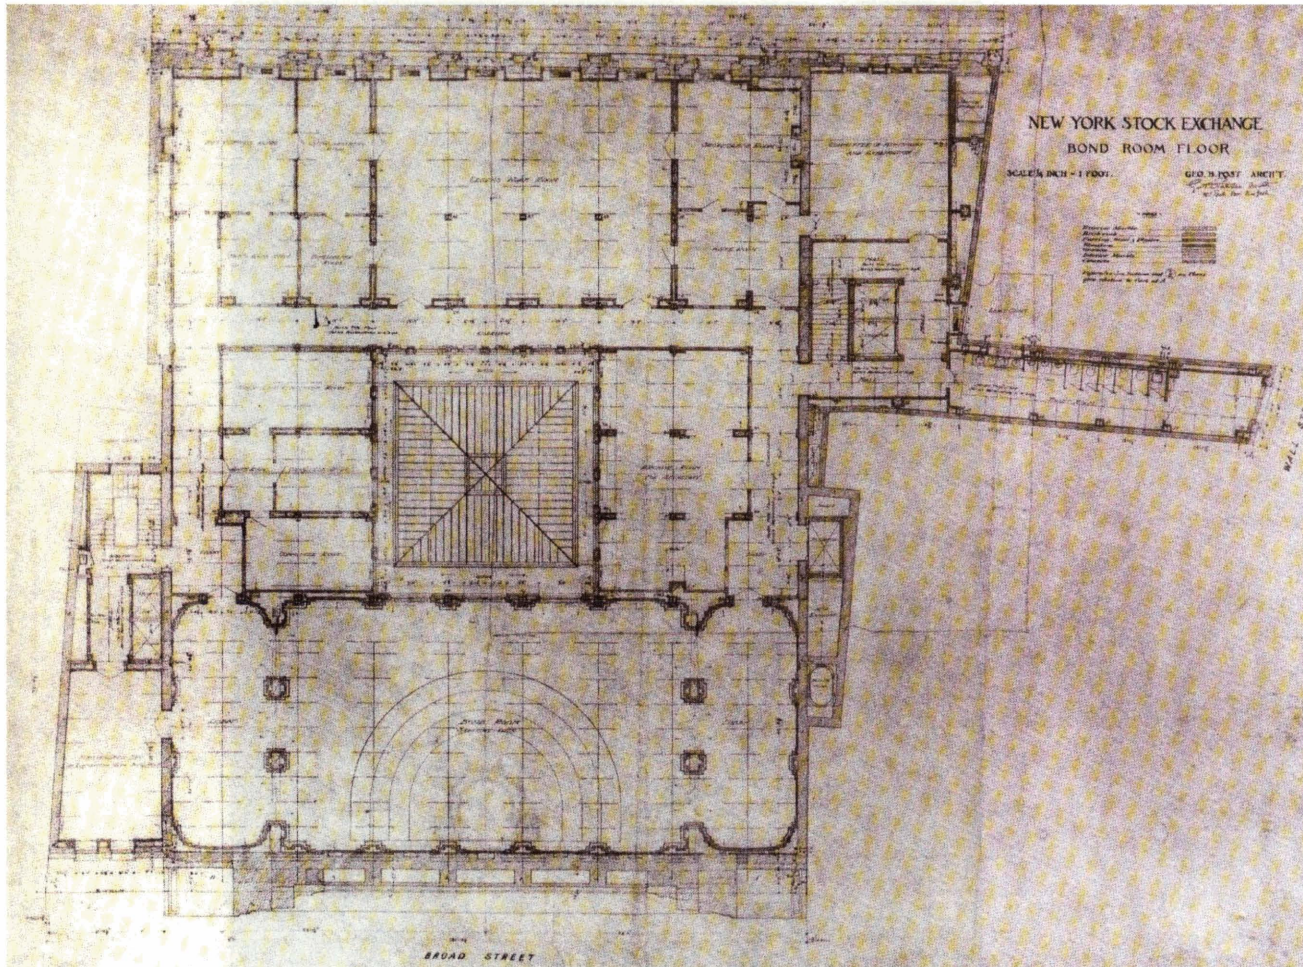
George Post's design for the New York Stock Exchange on Wall street
